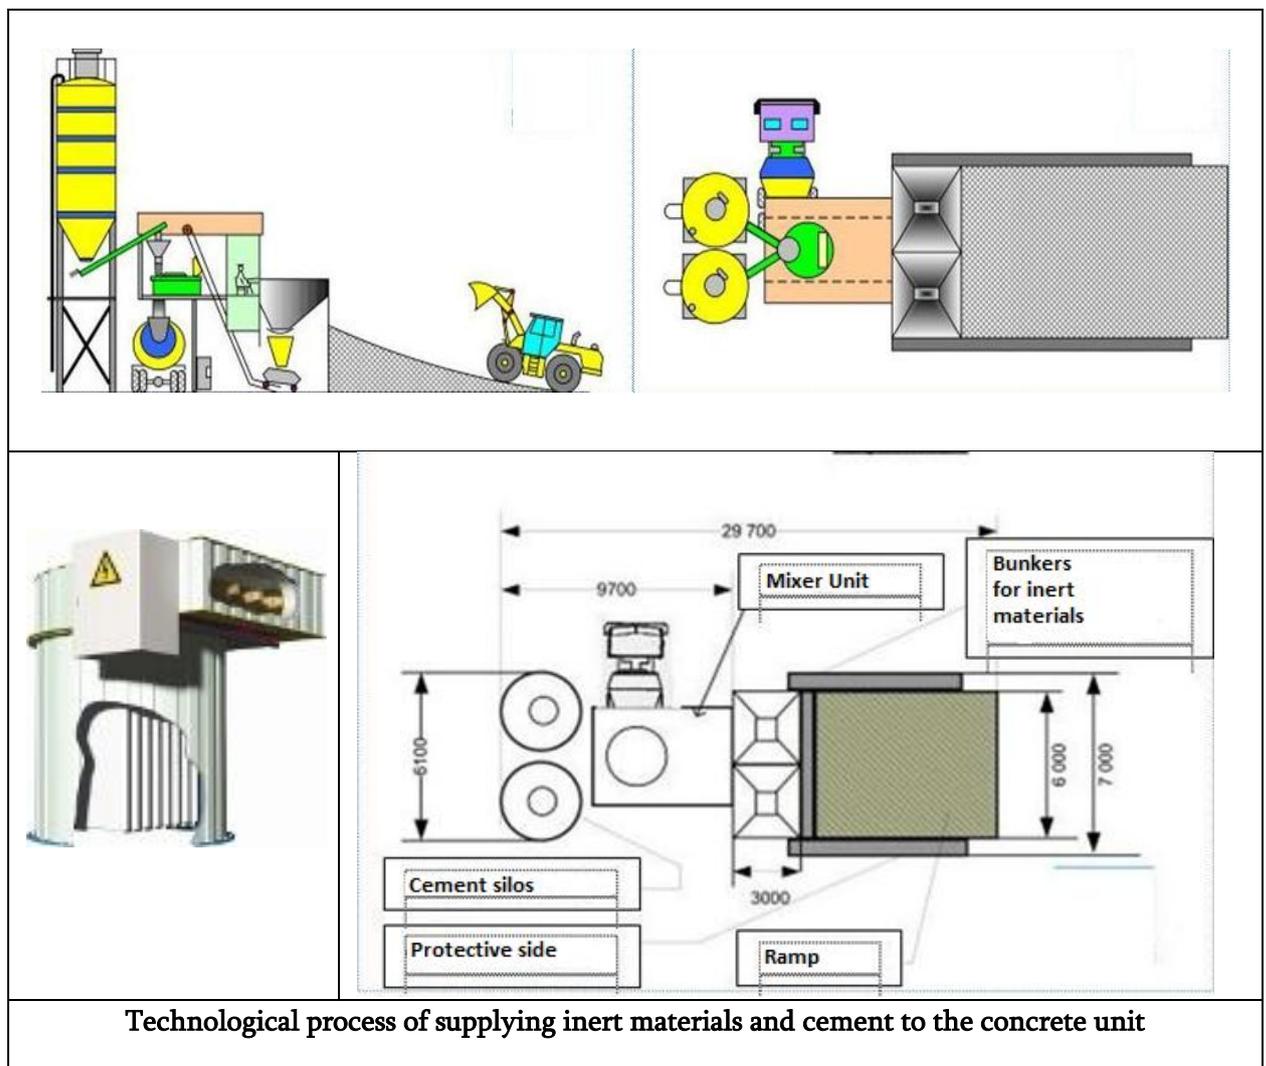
Layout scheme of mobile concrete batch plant (Source: Universal Company)
